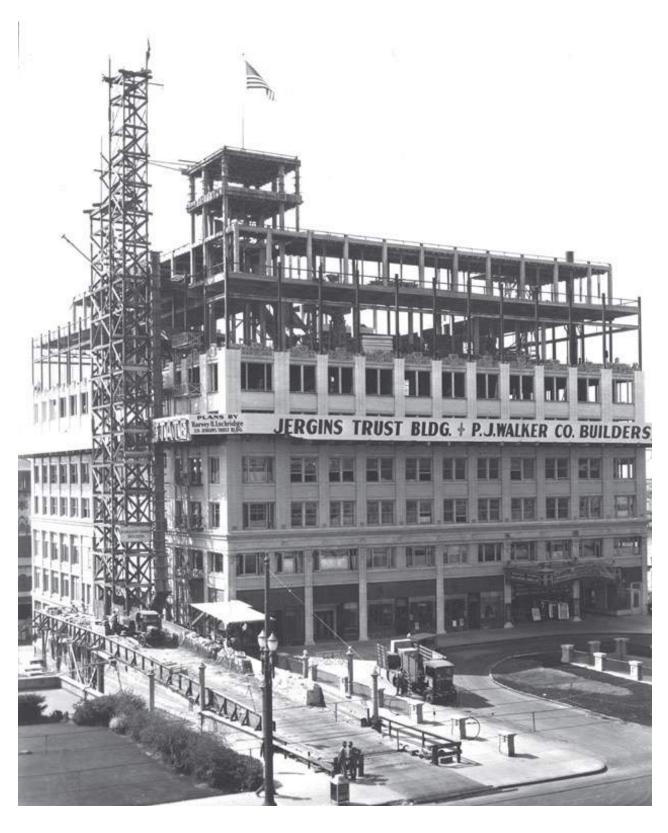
Additional floors being added, ca. 1928. Source: Los Angeles Public Library.
